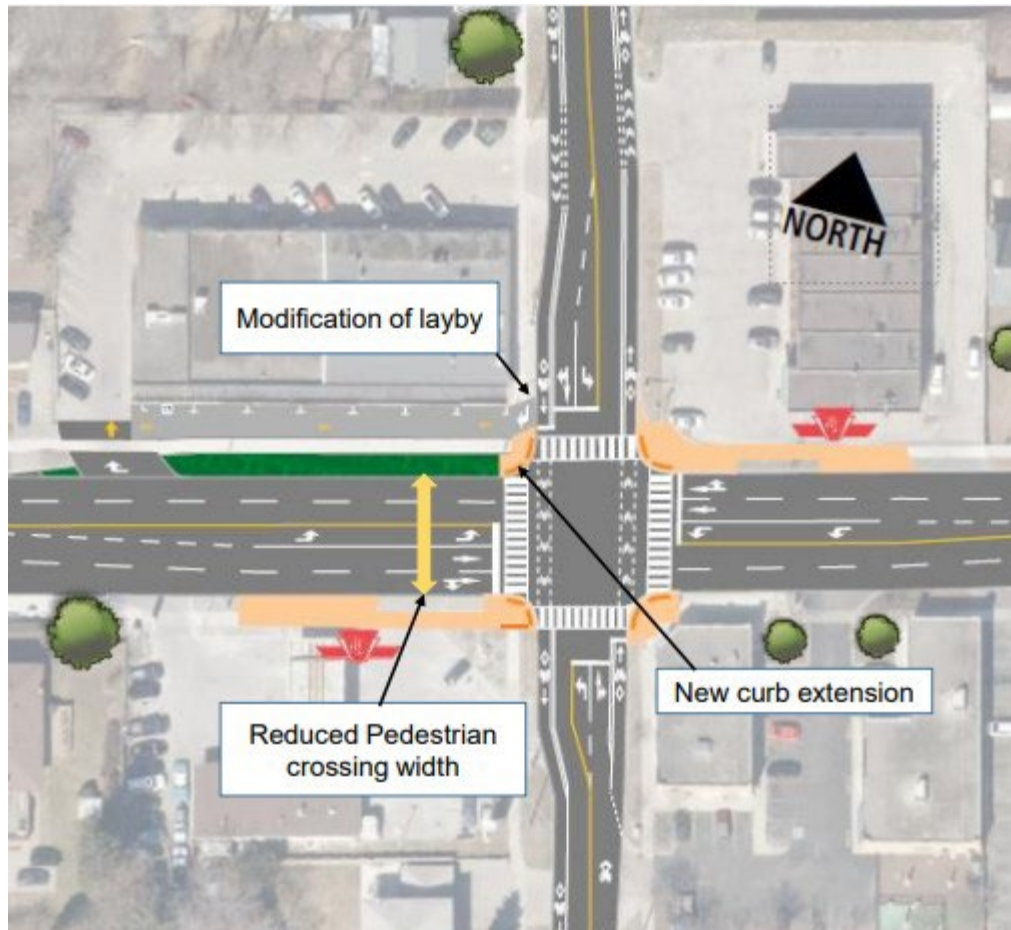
An artist rendering of the intersection of Martin Grove Road and Burnhamthorpe Road
